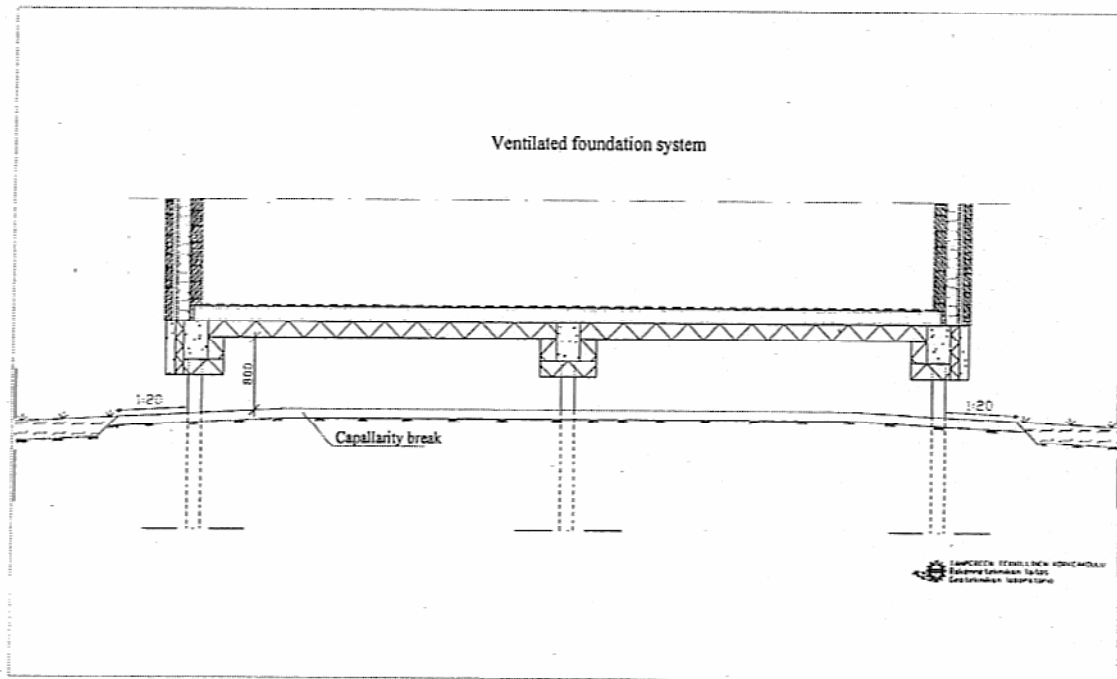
Example of ventilated ground floor with drilled piles /10/.
